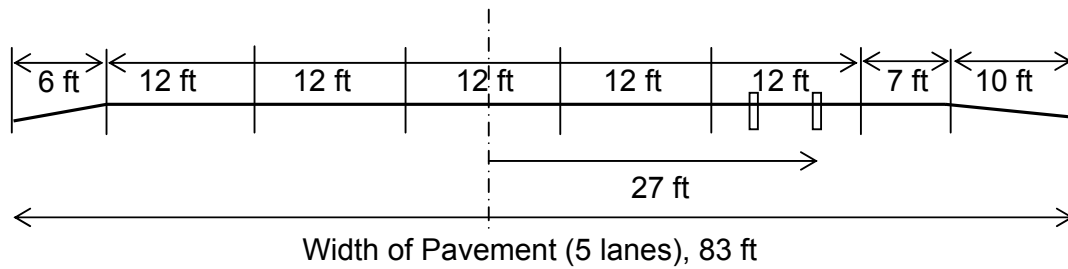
Dimension of Cross Section of the Pavement for Section C, Fort Worth North Loop IH 820.
